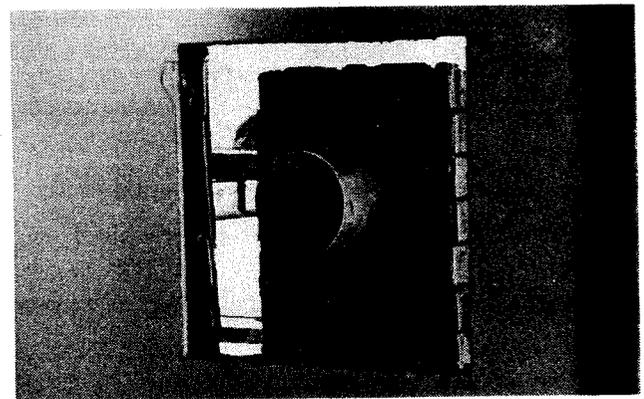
Interior view, showing wall opening and thimble before bricking-in.
